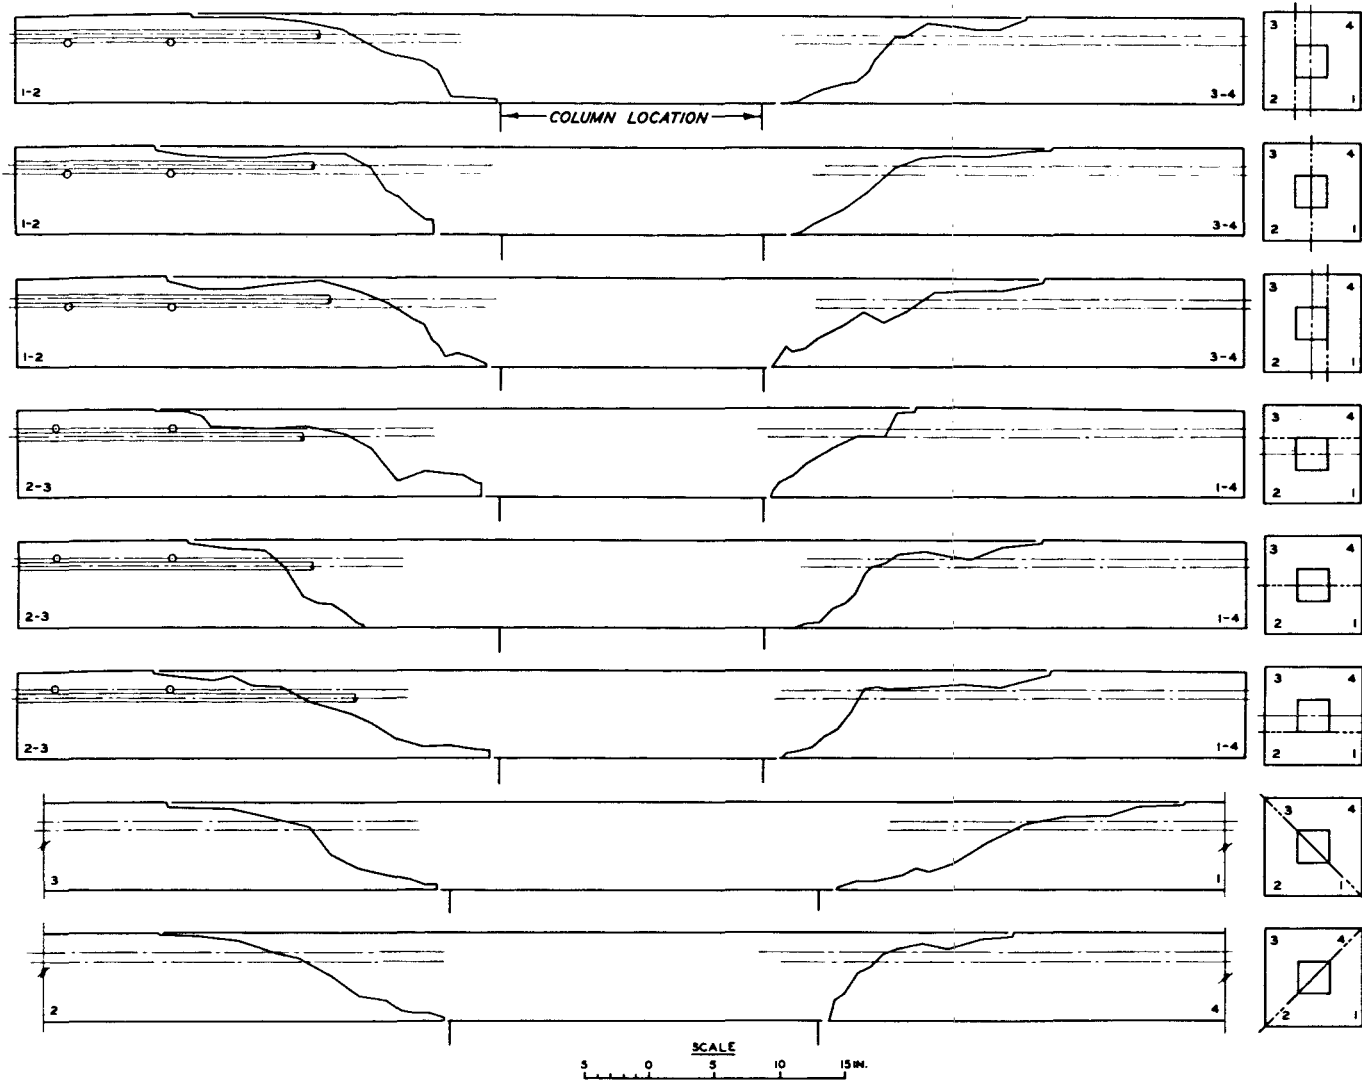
Profiles of slab failure surface, Specimen D4075-1.
